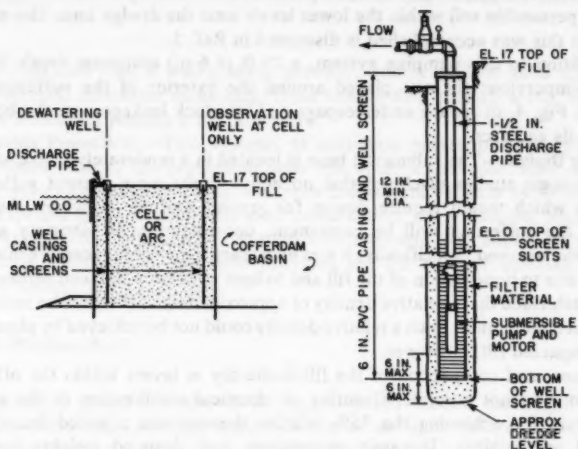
Cell Fill Dewatering and Observation Wells (1 in. = 25.4 mm)
